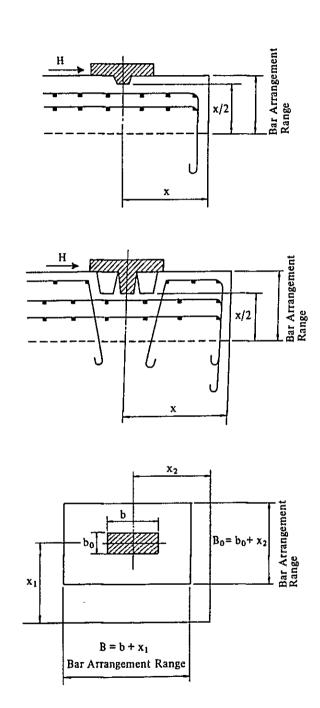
Reinforcing Bar Araangement for Bearing Surface
